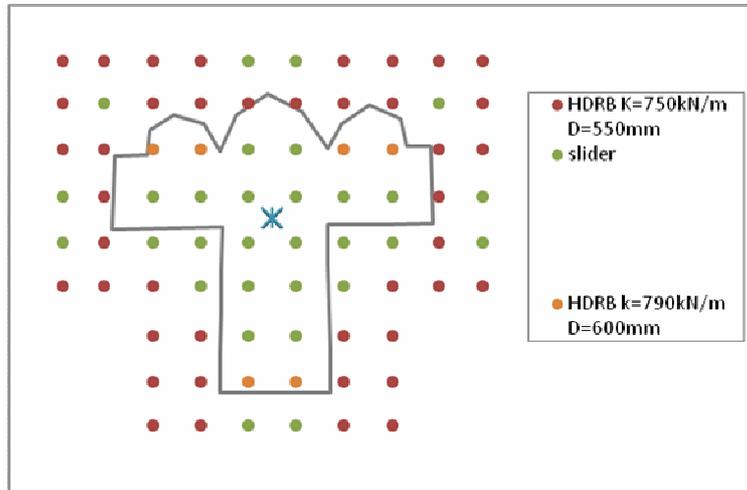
Final configuration of the devices stemming from the technique in [12] applied to the prototypal cross-shaped church.
